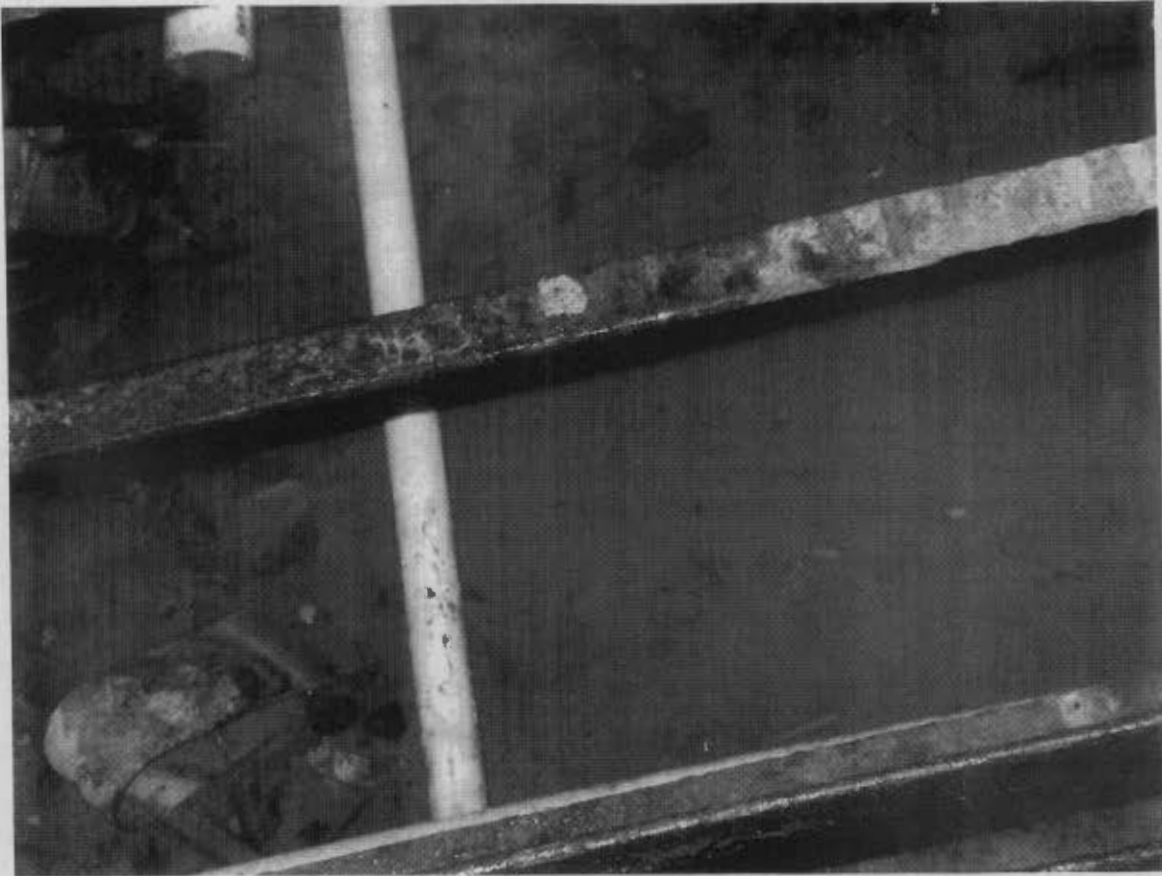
Another view of plating area floor with epoxy coating, near tanks 61-65 on the east side of the plating area
